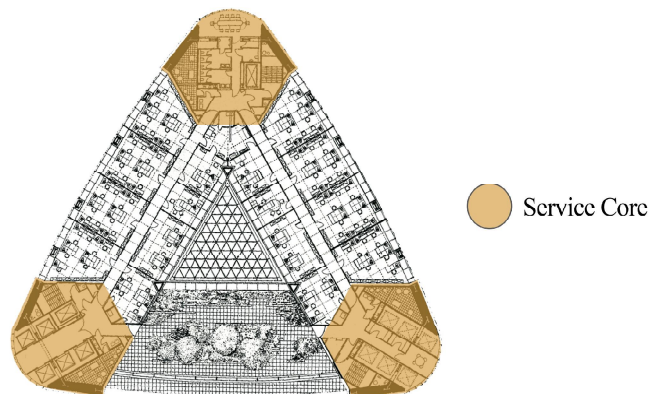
Commerzbank Tower, floor plan (Foster+Partners, 1997)
